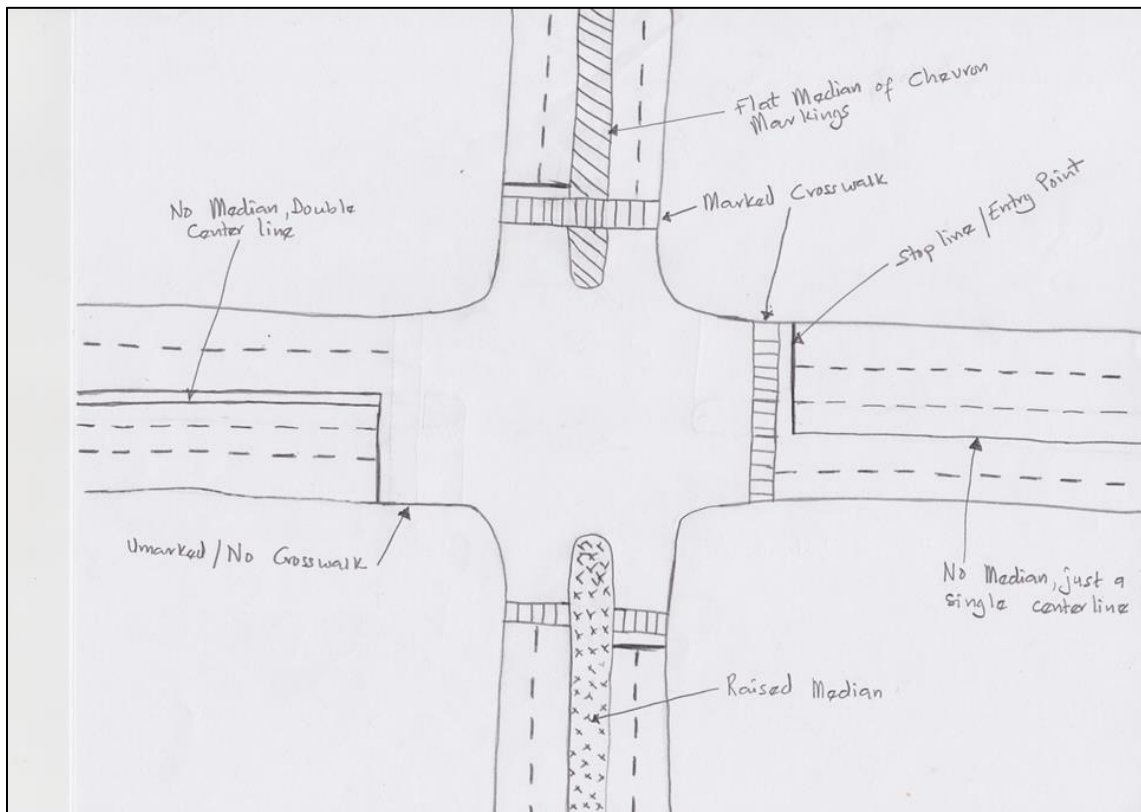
Labeled Diagram of Typical Conventional Intersection Layout
